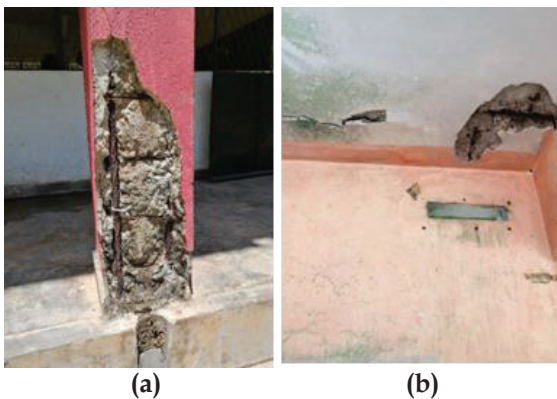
Deteriorated RC elements in Sri Lankan school buildings (a) columns (b) slabs
